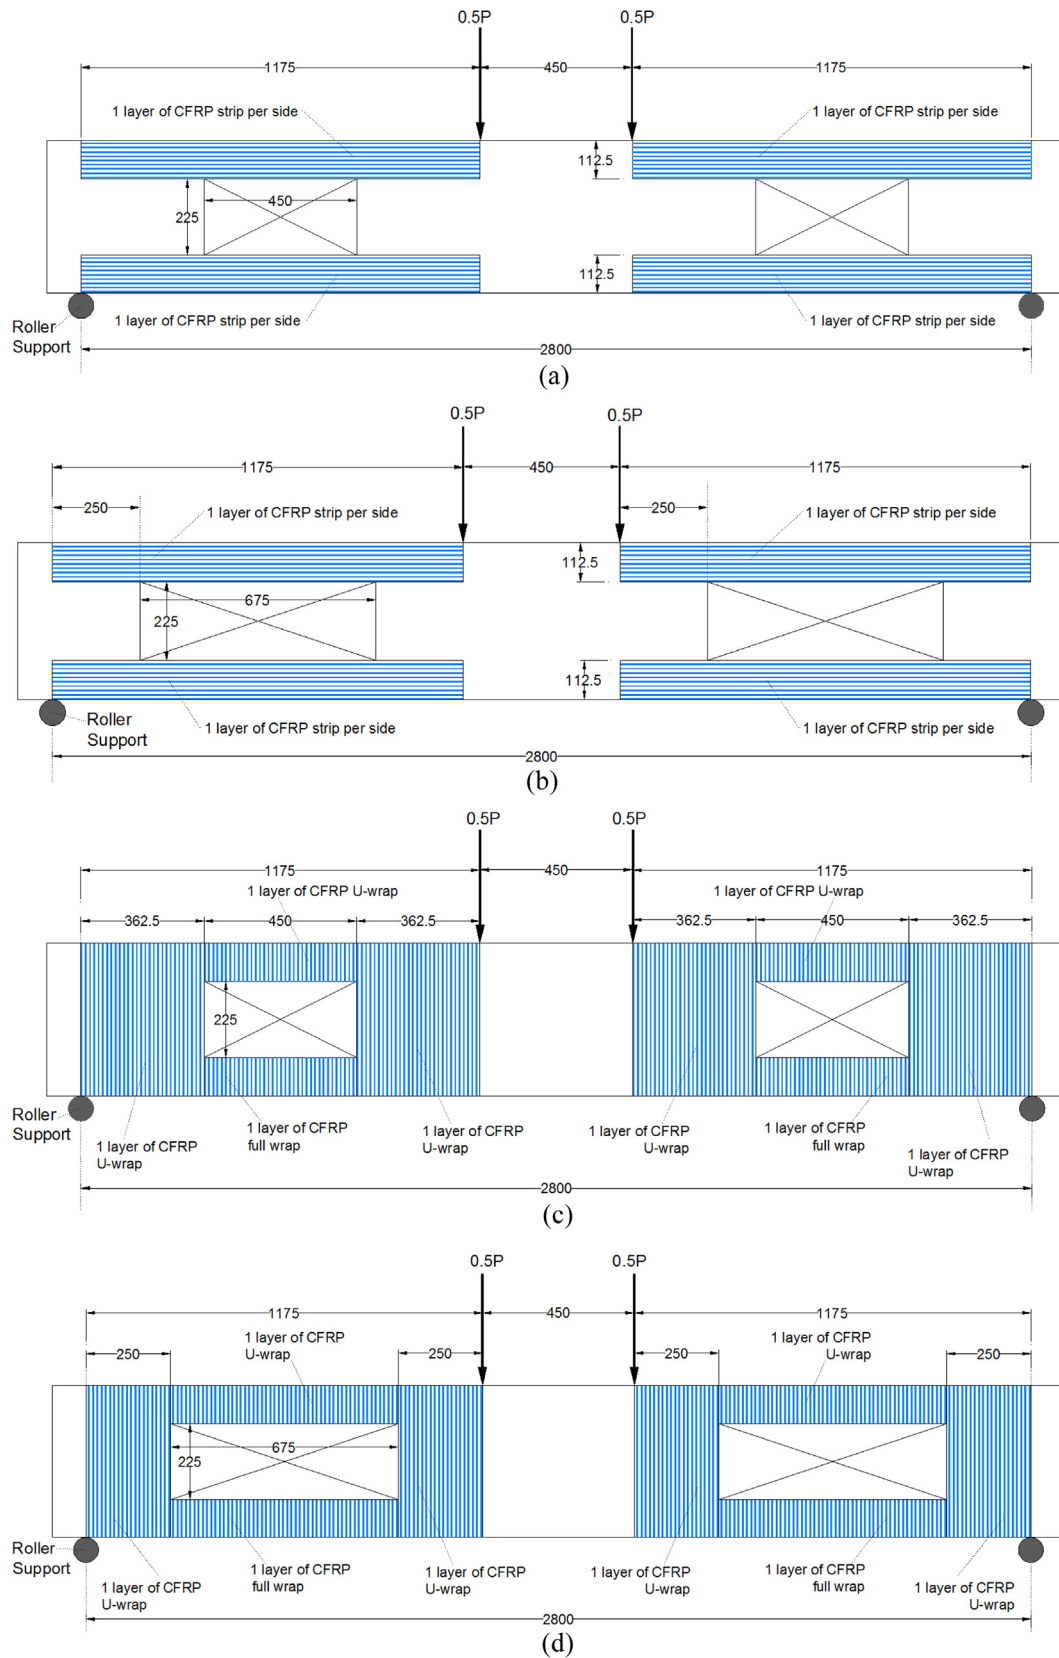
Details of beams strengthened with scheme-1 (Note: All dimensions are in mm): (a) 1st CFRP layer of specimen BS1-O1; (b) 1st CFRP layer of specimen BS1-O2; (c) 2nd CFRP layer of specimen BS1-O1; (d) 2nd CFRP layer of specimen BS1-O2.
